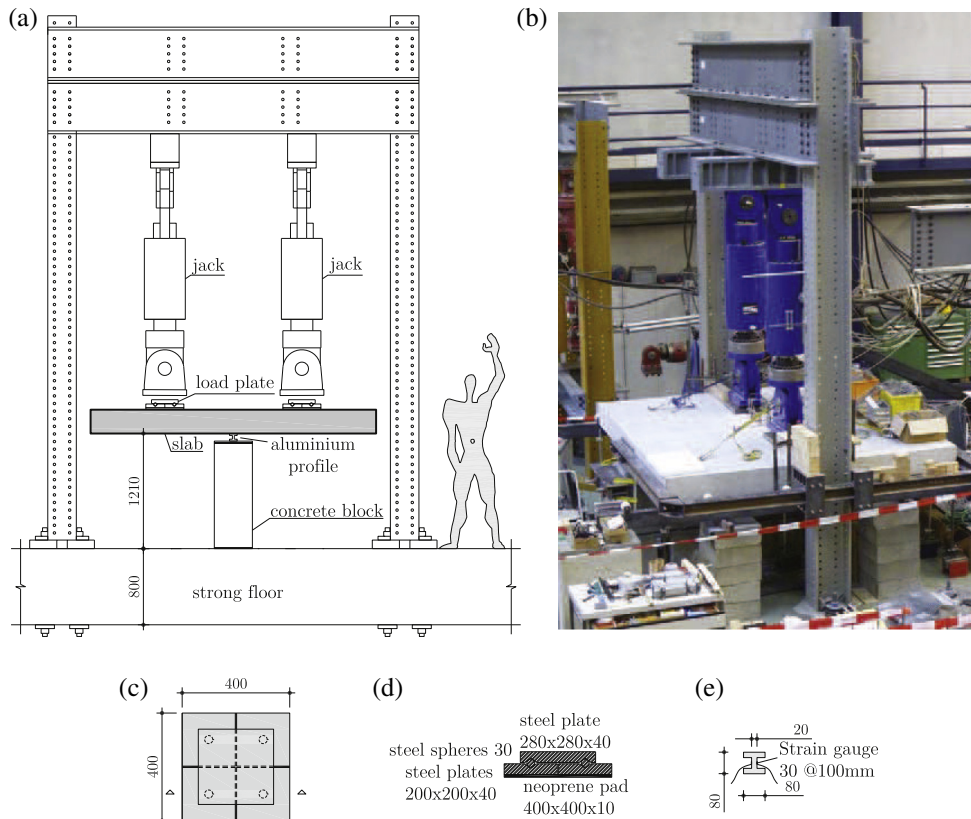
Test setup (dimensions in [mm]): (a) side view; (b) picture; (c) loading plate plan view; (d) loading plate section cut; and (e) cross-section of aluminium profile.
